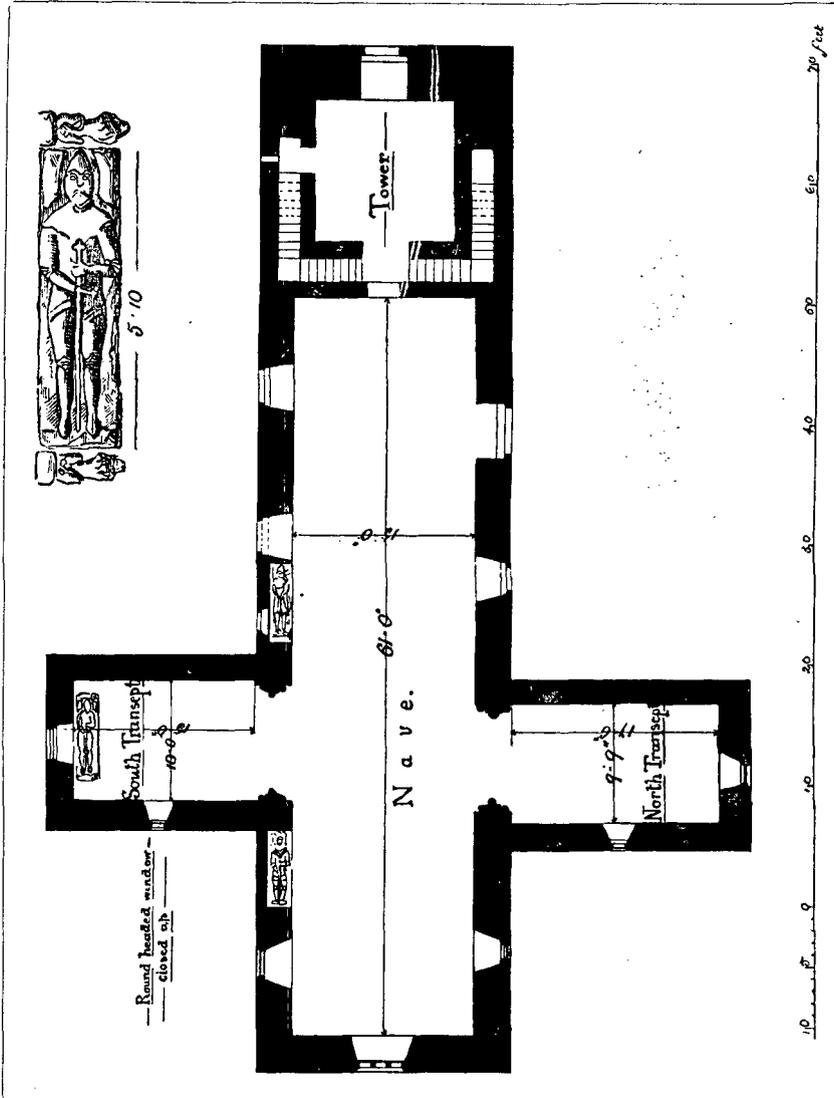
Ground Plan of St Clement's Church, Rowhill, Harris.
